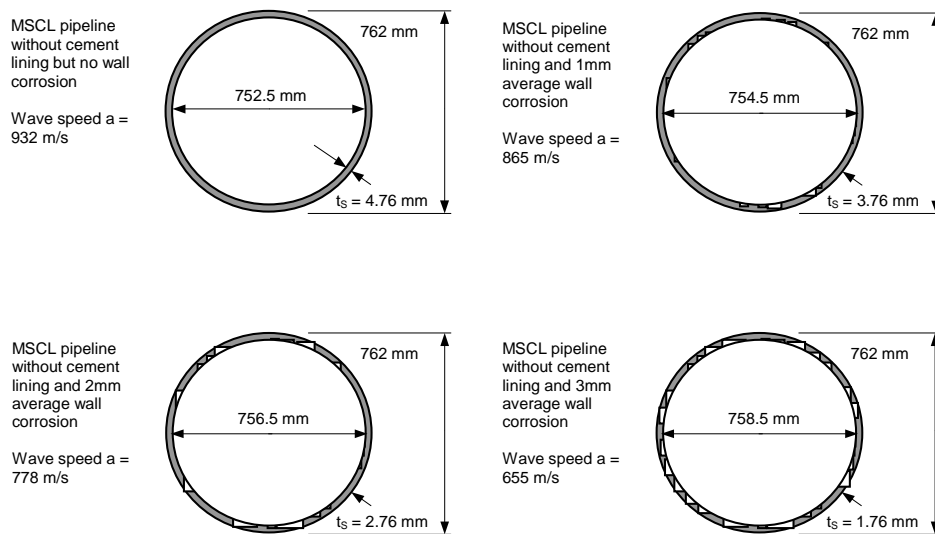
Four discrete levels of pipe wall damage for the Morgan Transmission Pipeline
